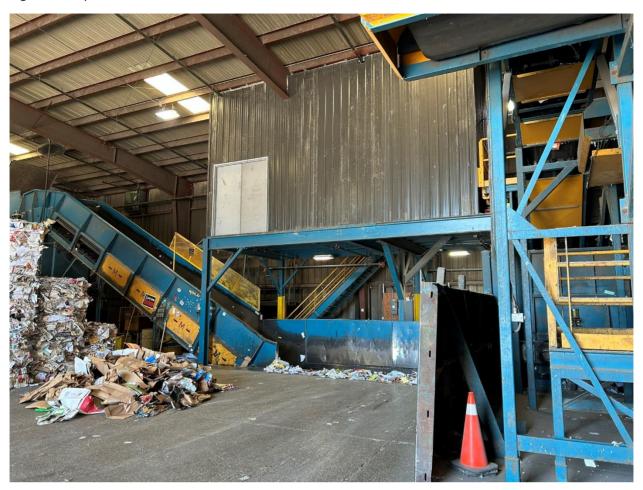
Southeast overview of compressor room, stairs, sort room
